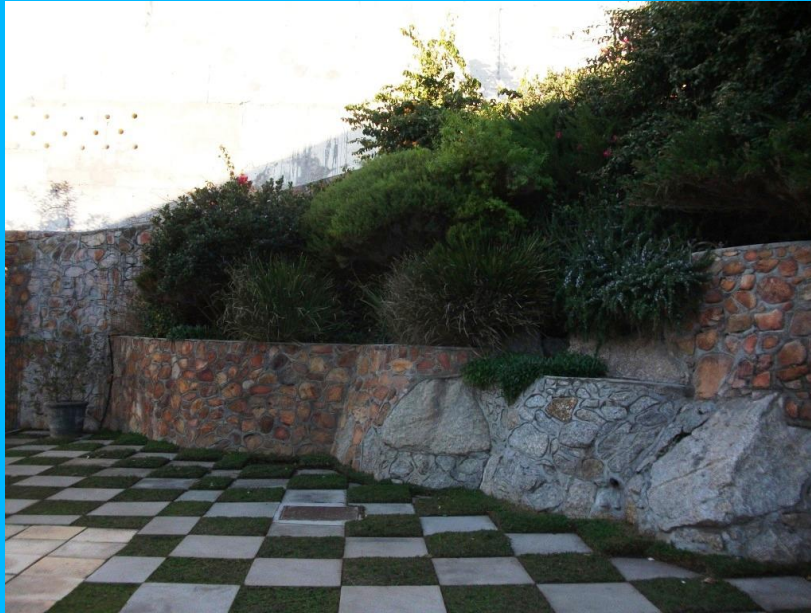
A CLOSE-UP IMAGE OF THE RETAINING WALL AND PLANTER, BOTH OF WHICH ARE PROPOSED TO BE RETAINED BUT SHIFTED SOMEWHAT NORTH-EAST. THE GRANITE BOULDERS AND AS MUCH VEGETATION AS POSSIBLE WILL BE RETAINED AND ANY PLANTS WHICH ARE REMOVED WILL BE REINSTATED USING INDIGENOUS PLANTING.
